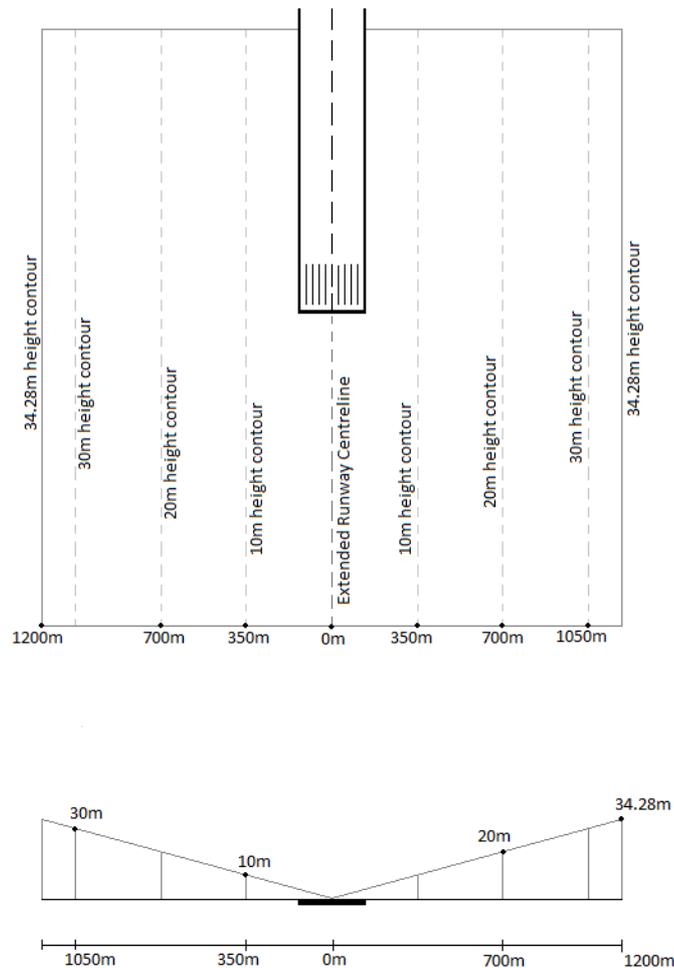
Plan view (top) and elevation view (bottom) of the 1:35 surface
